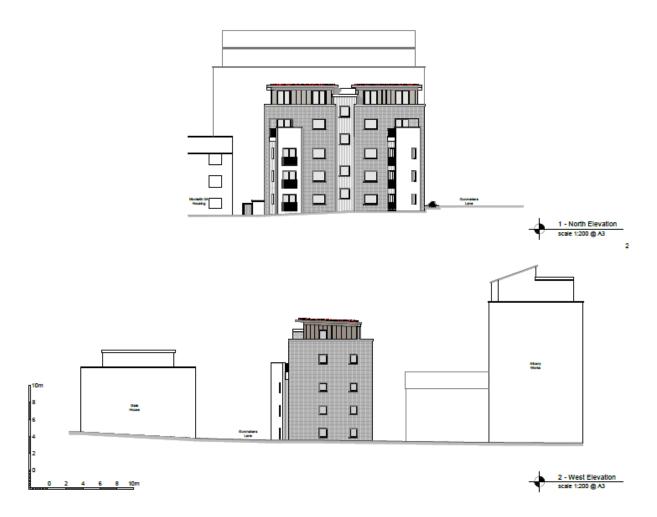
Contextual elevations showing the proposals against Albany Works to the south and Gate House to the north
